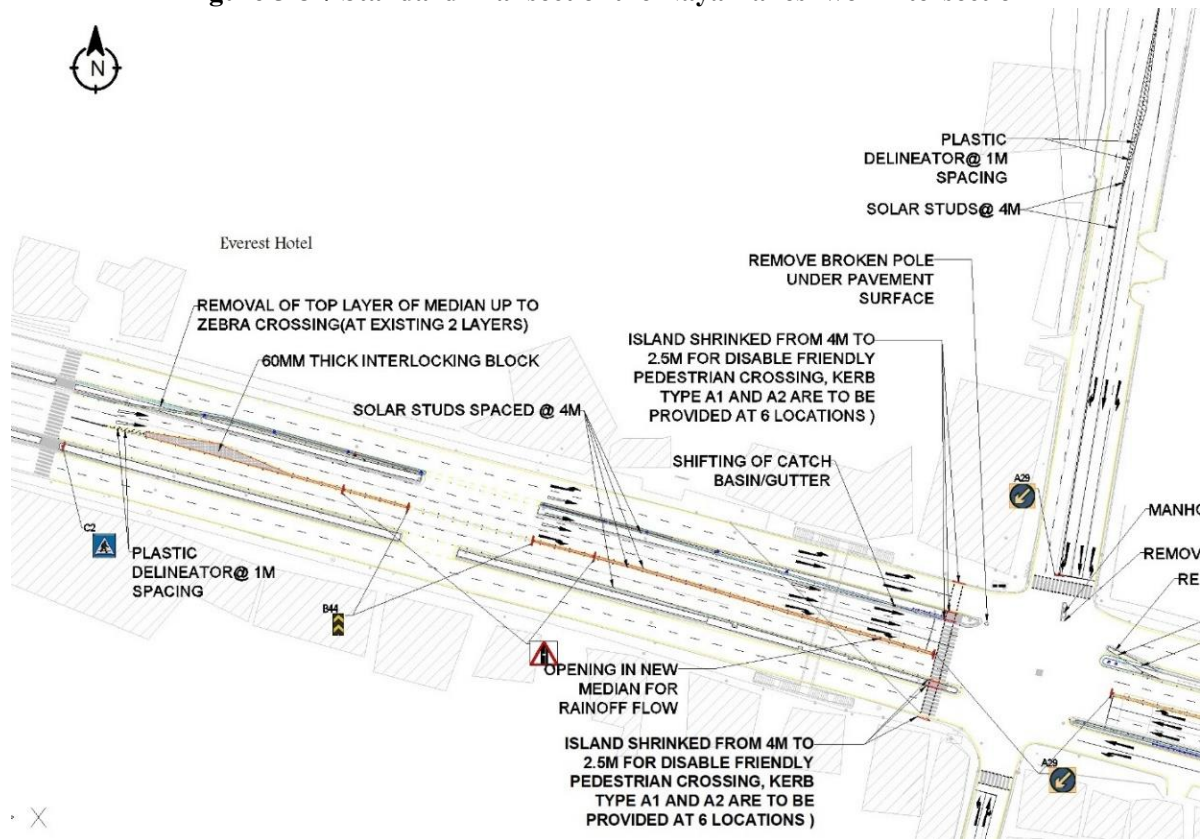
Naya Baneshwor Intersection Improvement Plan (2)
